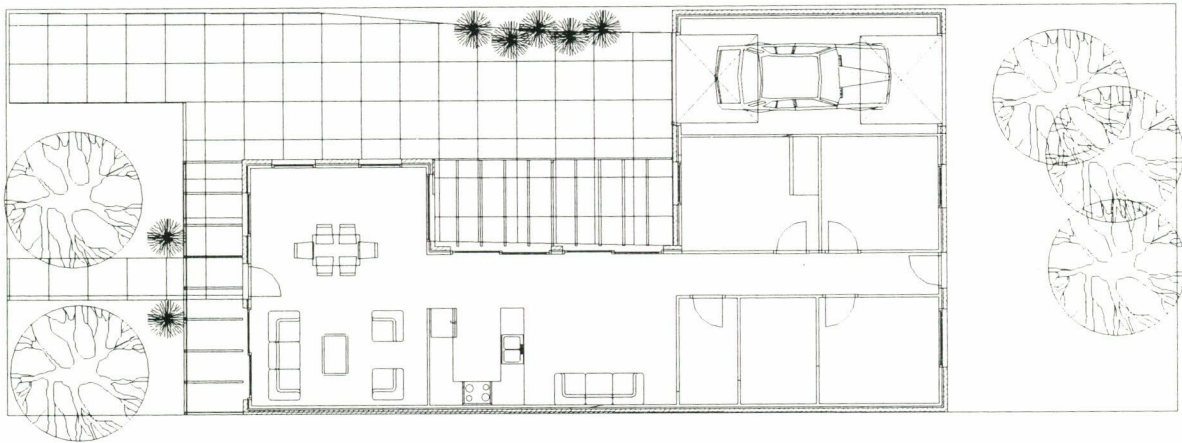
COURTYARD HOUSE WITH 10 M WIDE FRONTAGE
